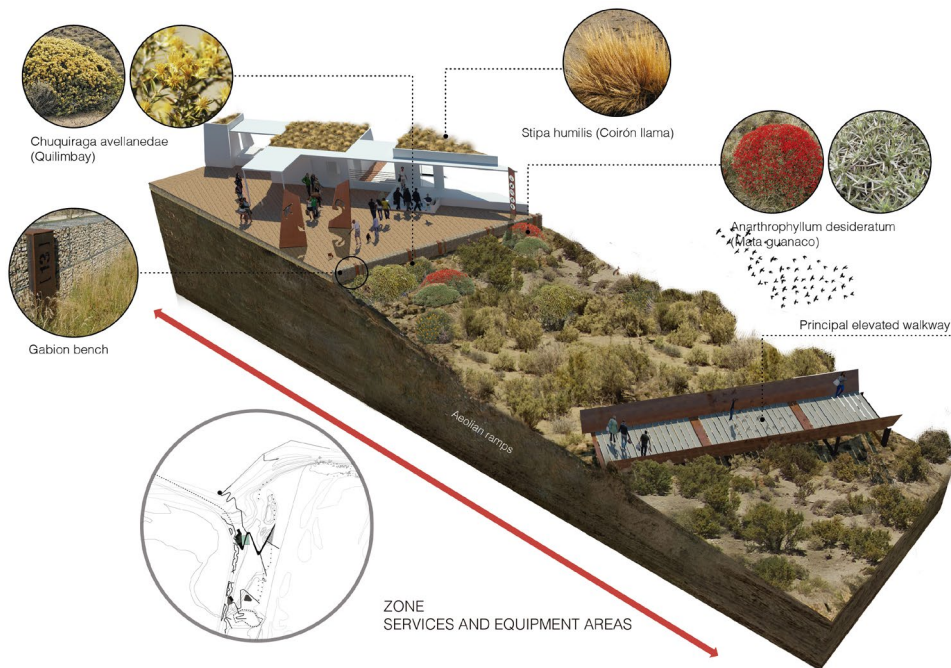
Interpretation center and principal elevated walkway detail (services and equipment area). Source: author’s elaboration.
